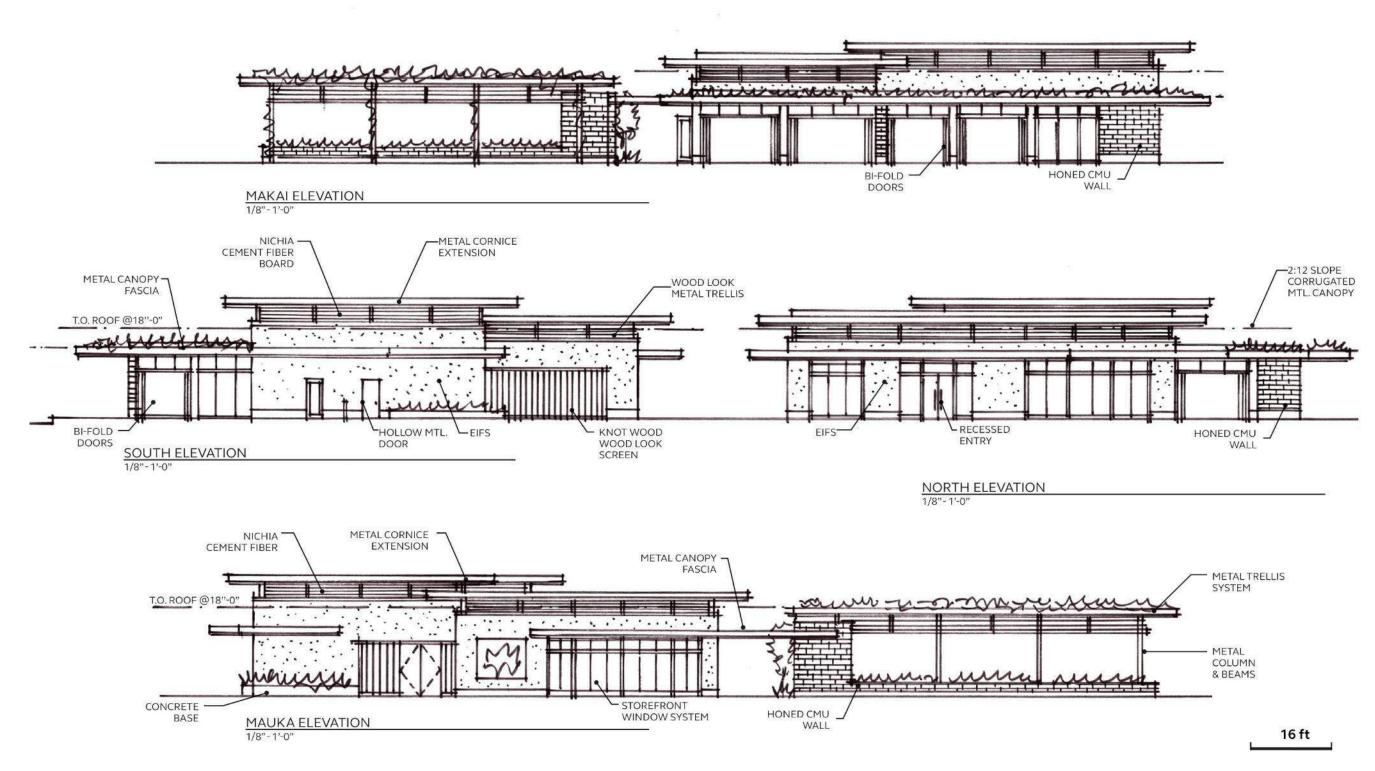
Restaurant Building 6 - Preliminary Elevation
